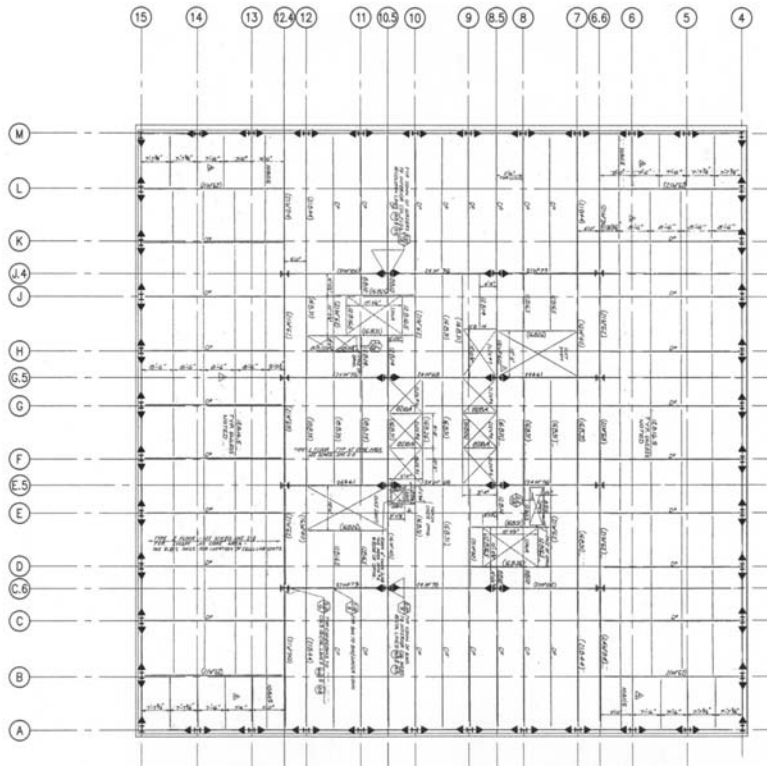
Typical Floor Framing of the DPW Building [Chen et al., 2001]
